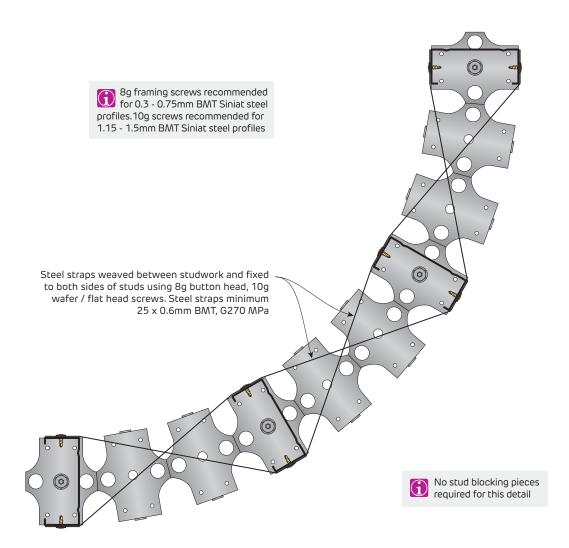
Strap Nogging for Curved Stud Walls Plan
